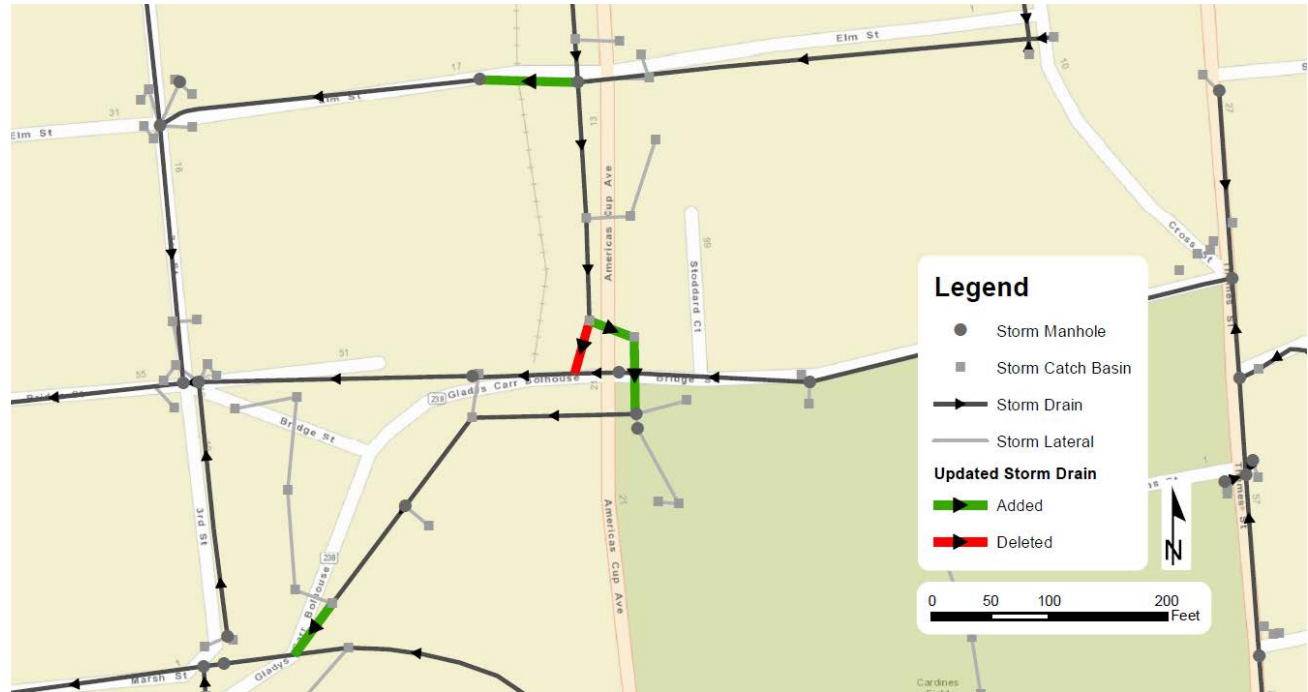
Storm Sewer GIS Corrections for the Bridge Street Study Area
